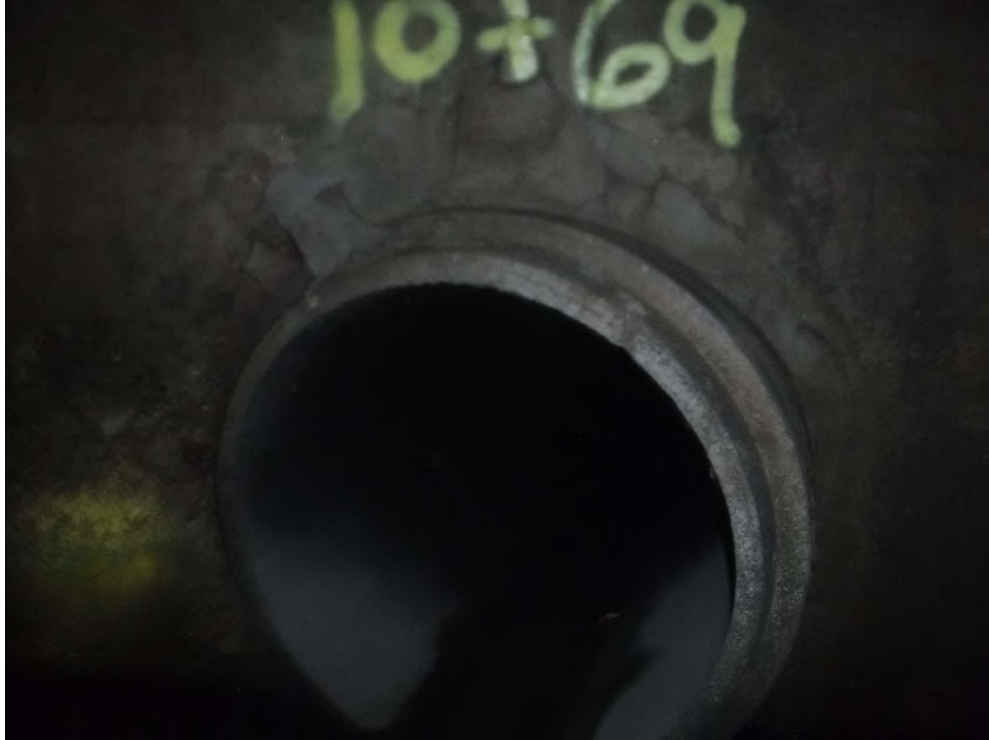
STA. 10+69, 30" concrete. Recommend grouting connection.
